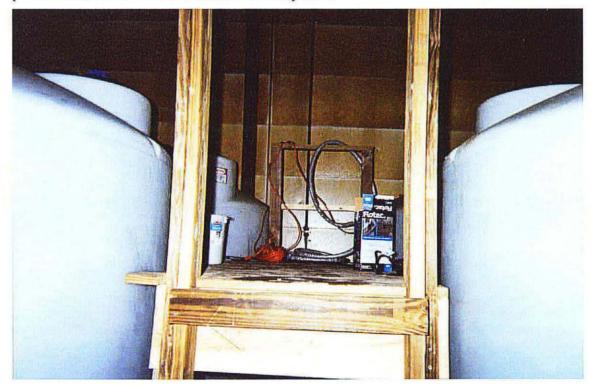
Looking west, picture of the access platform and ladder taken from ground level.
